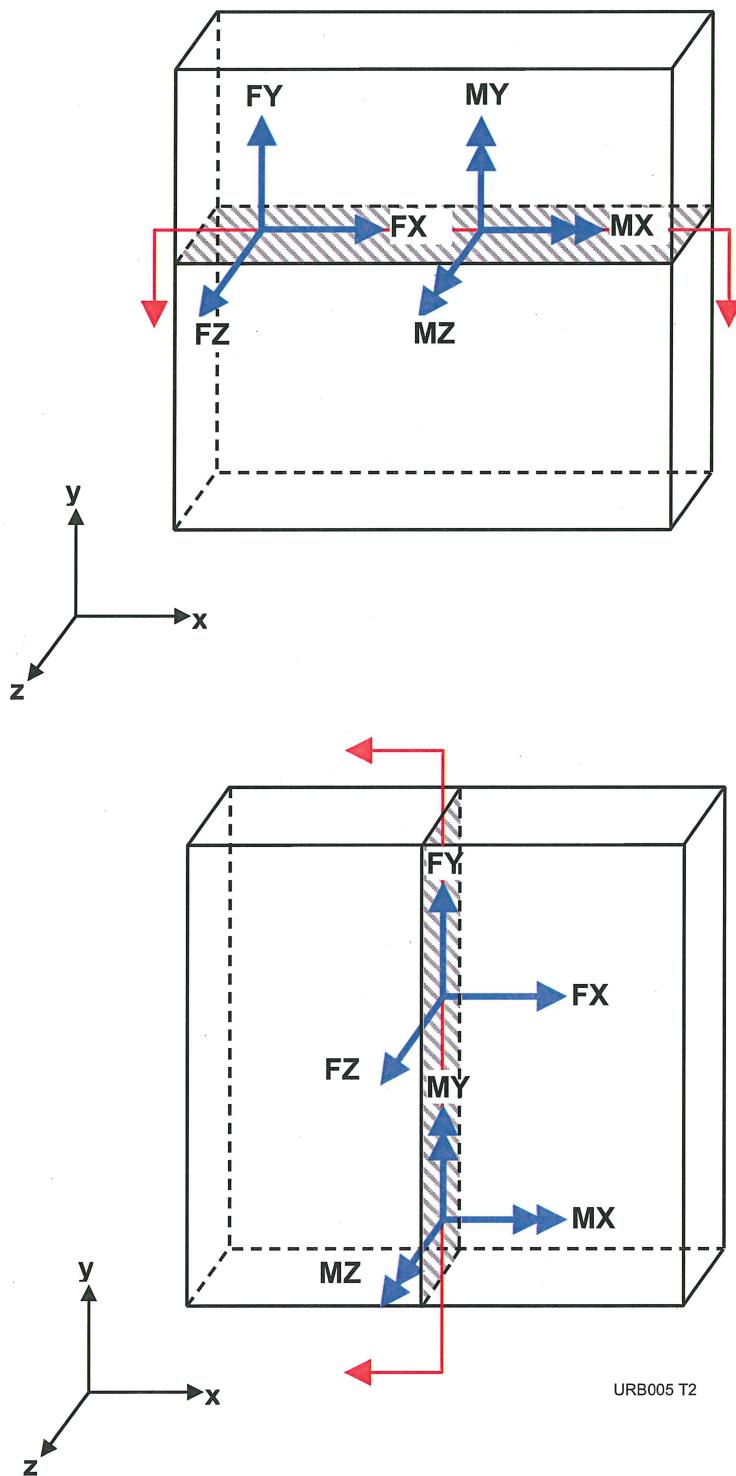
E.3-6—Vertical and Horizontal Section Cuts for ESWB Wall at Column Line 4
